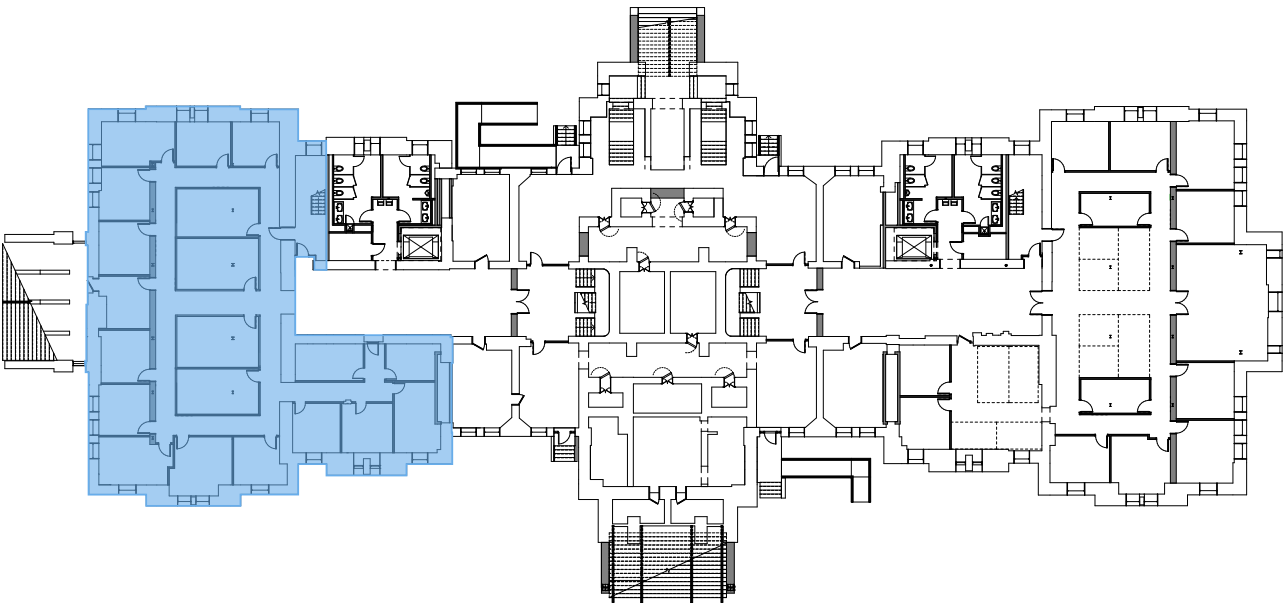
Proposed Space Allocation: Legislature and LSO - Garden Level [Capitol]
